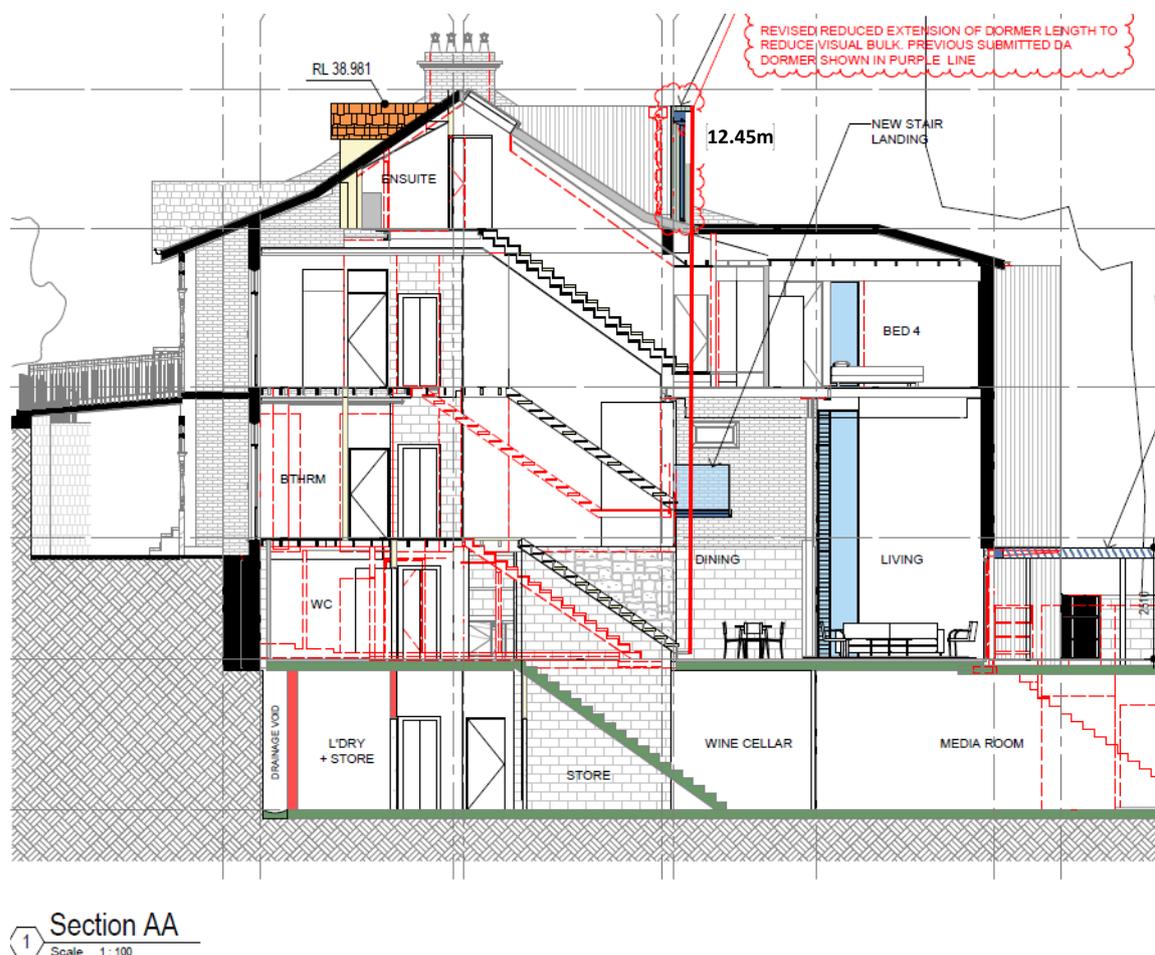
Section AA showing height above ground level existing (indicated). Ground level relates to the existing lowest ground floor of the building
